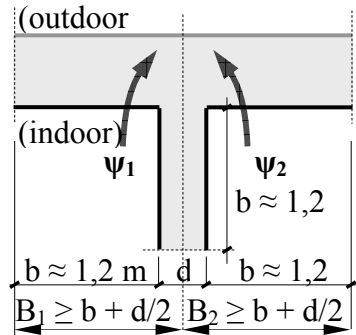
Thermal bridge at the intersection of an exterior wall with an interior one. The definition of term „B” from the relation (1)
